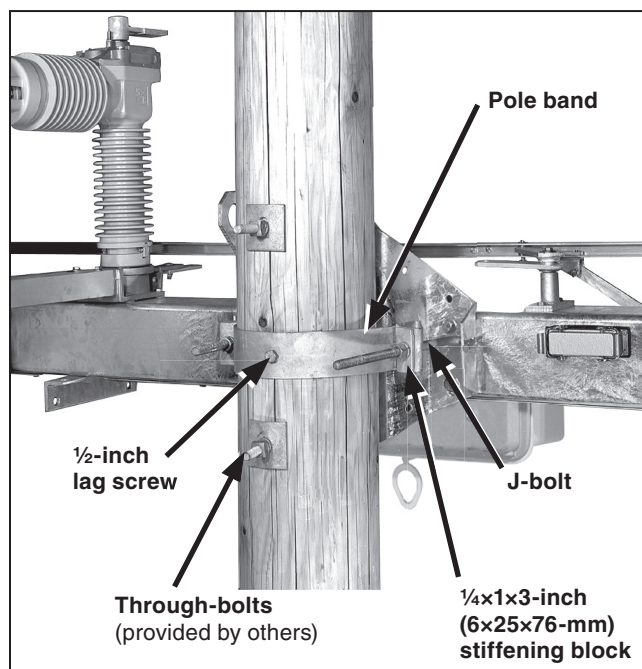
Securing pole band to mounting bracket (upright mounting configuration shown).
